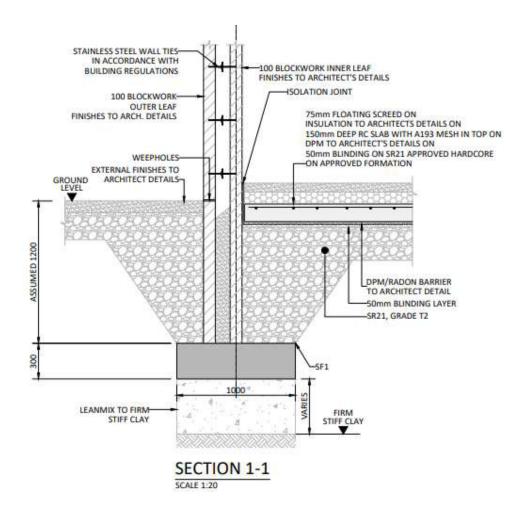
Typical Section through Strip Footing for Block Retaining Walls
